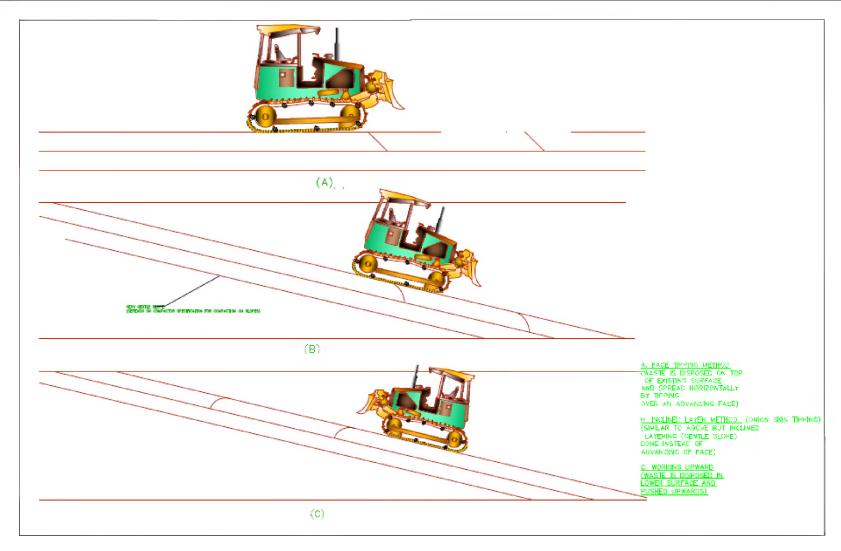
TYPICAL DRAWING – WASTE PLACEMENT AT LANDFILL SITE
